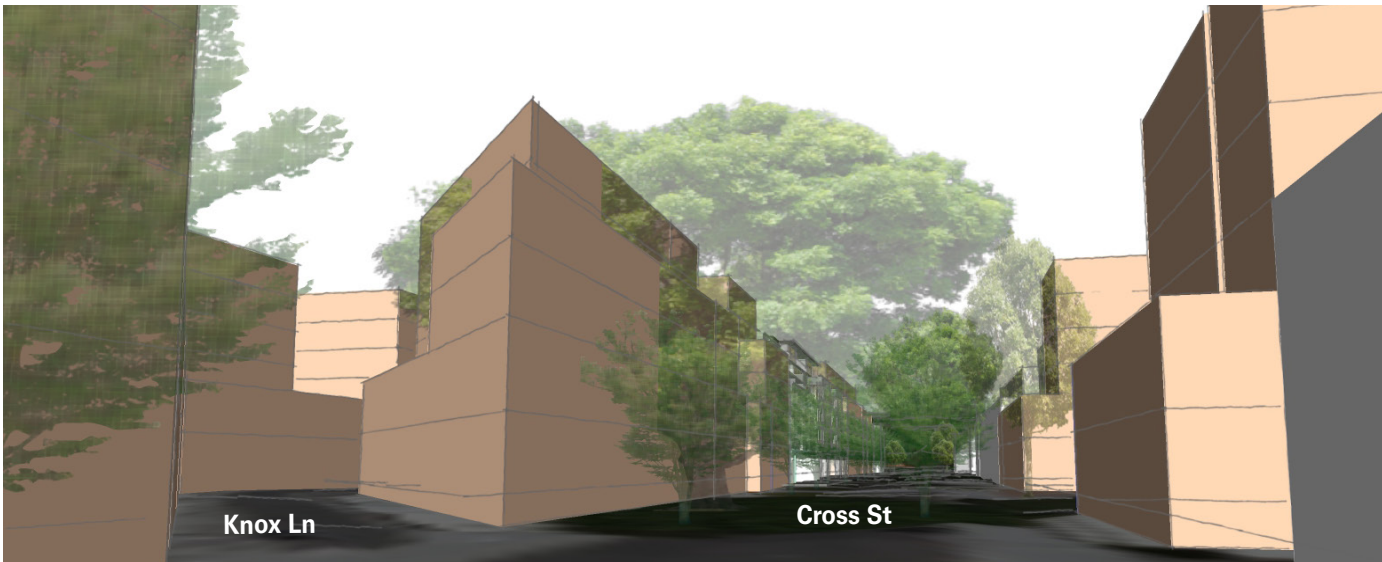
Indicative building envelope - View 2: Cross Street looking towards Bay Street
